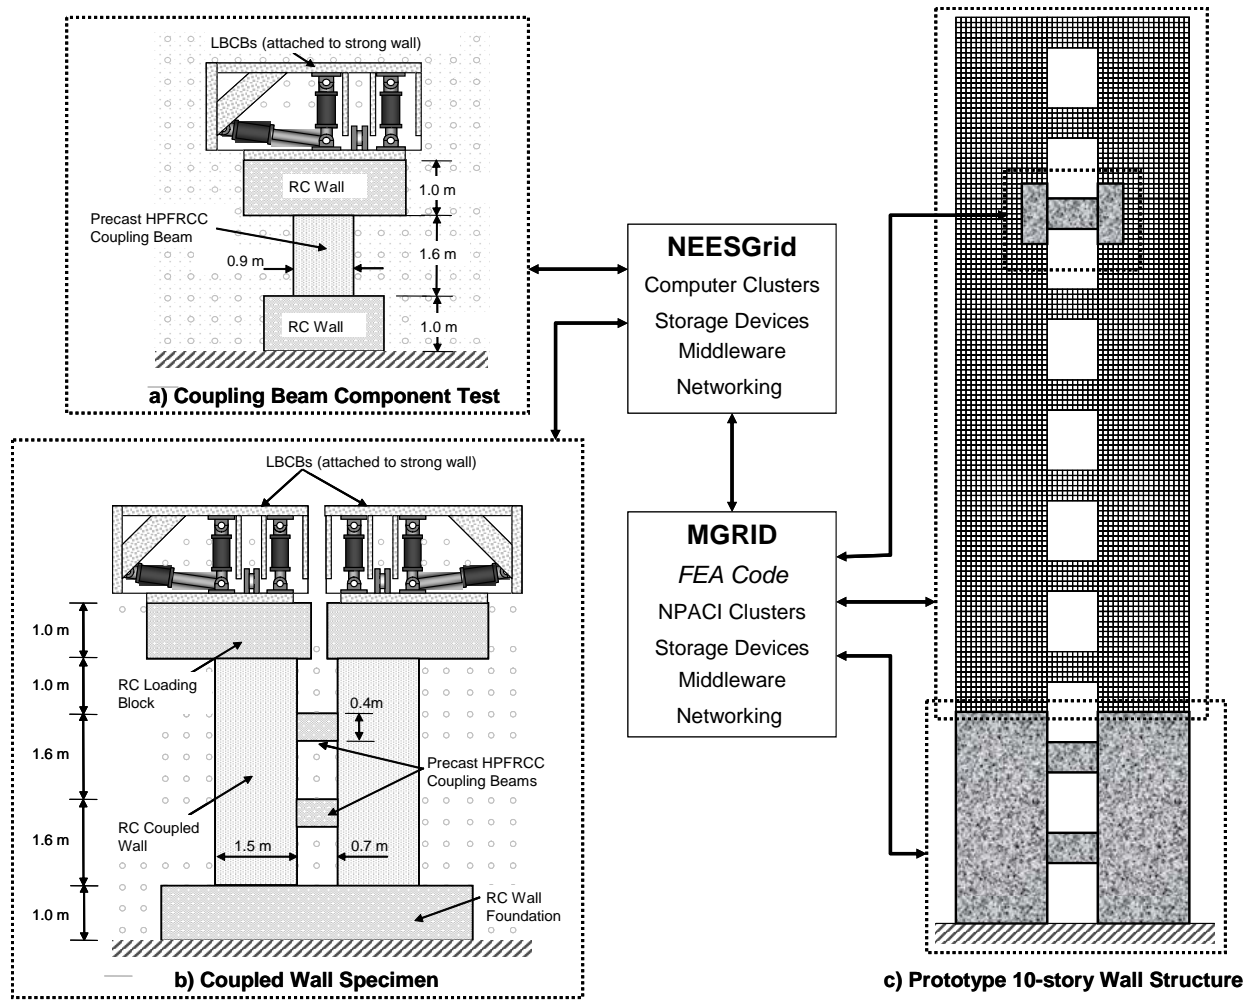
Test specimen simulating coupling beams and coupled-wall base
